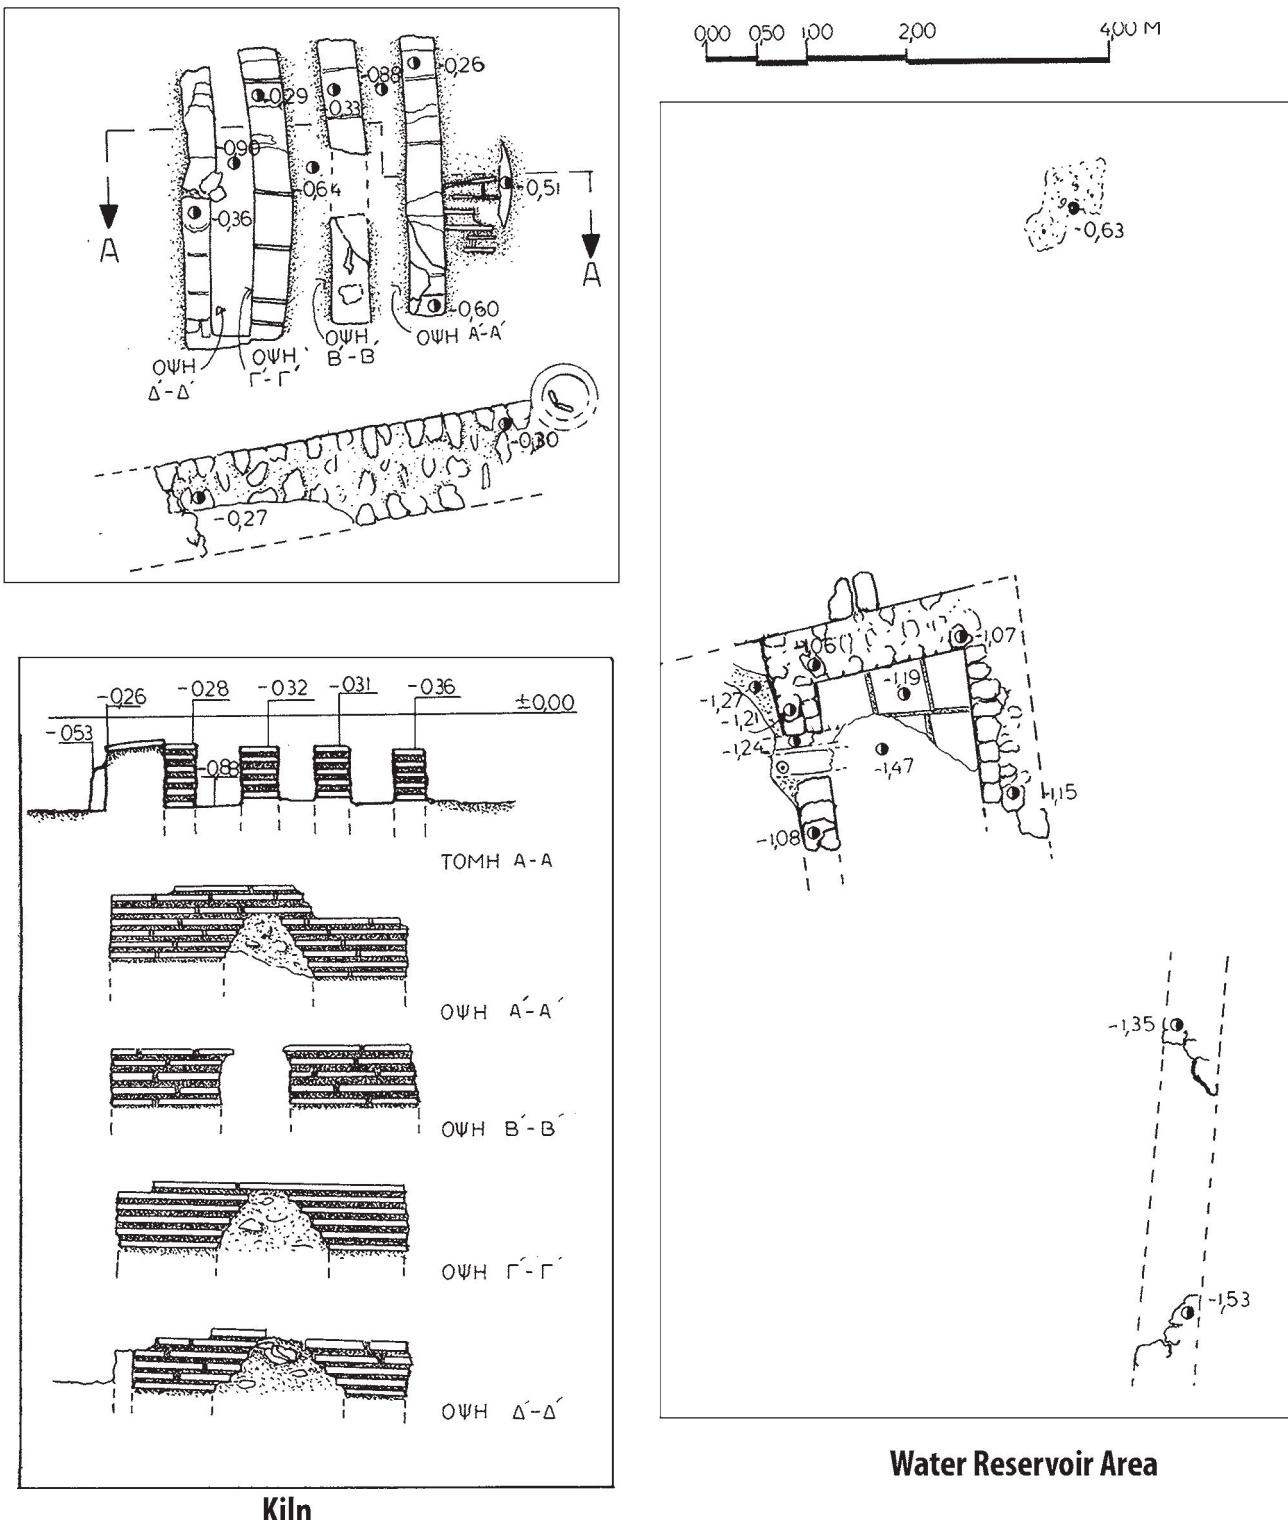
Vasilika, plot 127, plan of the excavation, and sections of the kiln.
